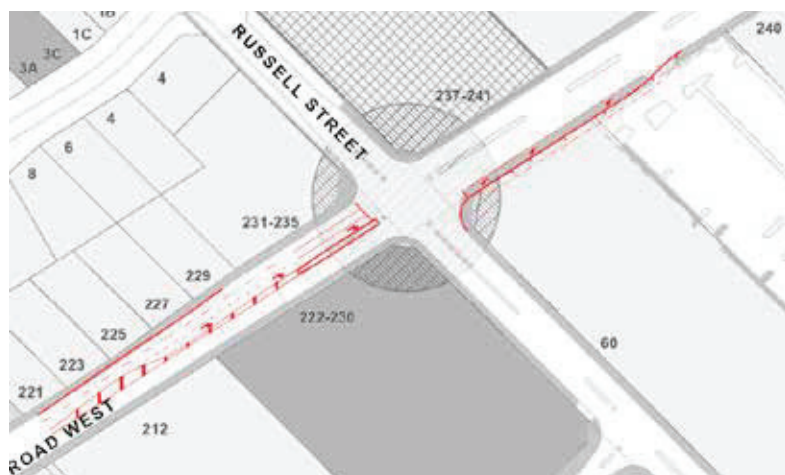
Walter Road West/ Russell Street – Modelled Scenario
